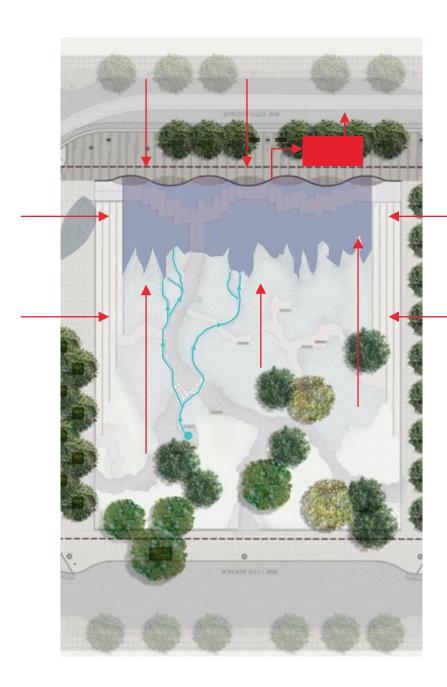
(previous page) Irregular shaped pond that filters storm-water runoff via the planted biotopes.
